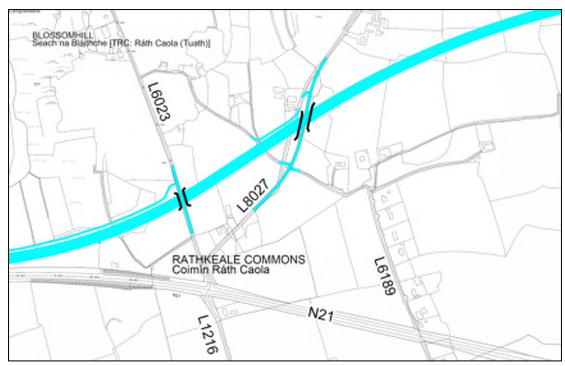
Potential Alternative Road Layout for L-8027 Clogh Road
